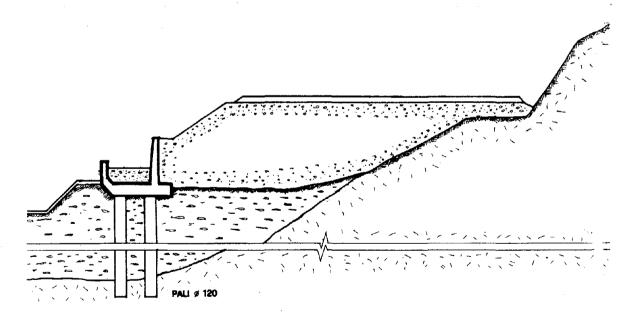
UDINE-CARNIA-TARVISIO HIGHWAY, SECTION THROUGH EMBANKMENT RETAINING STRUCTURE ADJACENT TO CANAL -FROM (10) have otherwise remained standing. No details were given on design criteria or construction methods.
